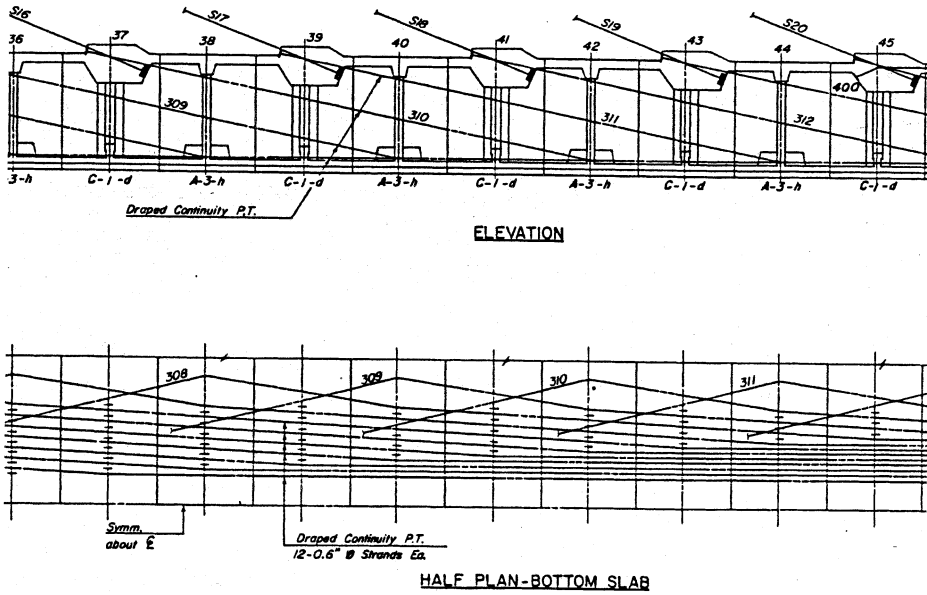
Sunshine Skyway, Florida — stay cables and post-tensioning layout.
